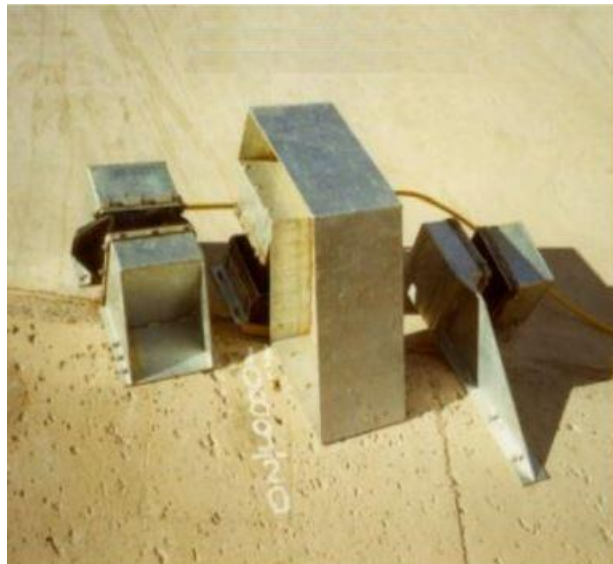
LVDT installed joint extensometer in a concrete dam site (Brylawski and Asce 2007)
